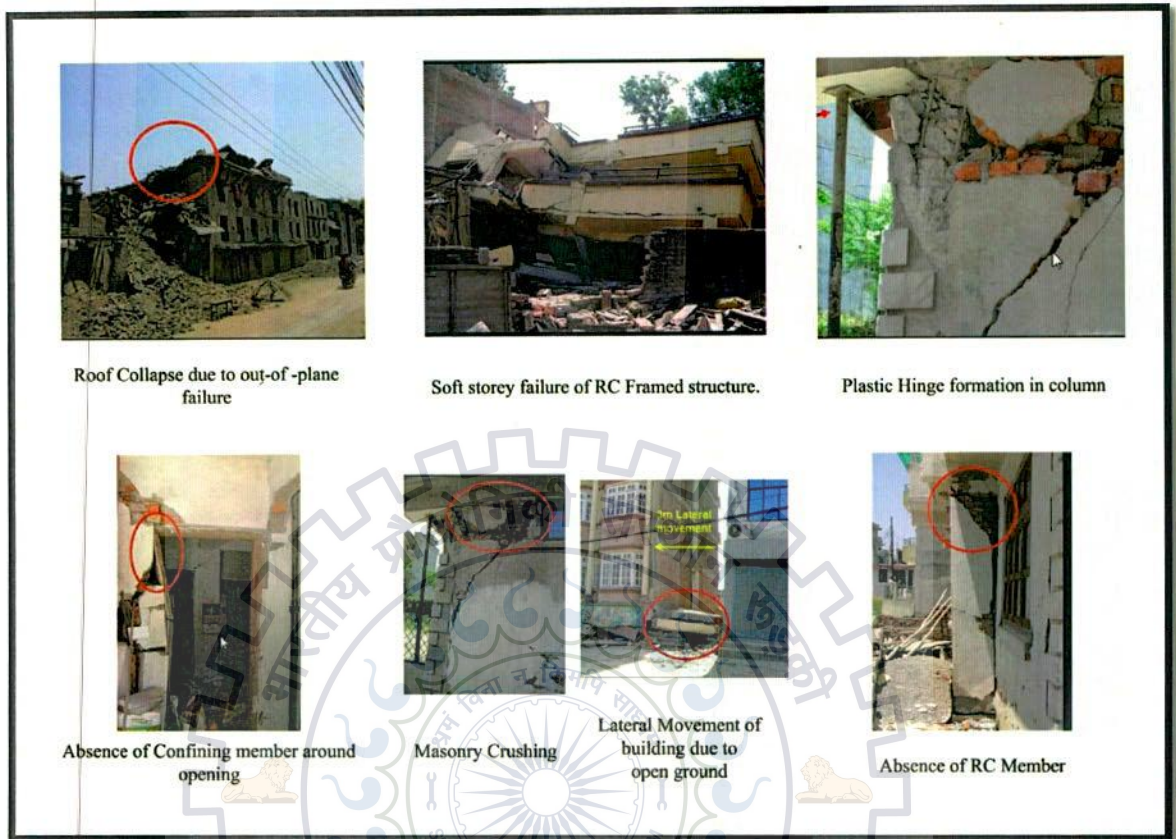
Various types of Cracks and Failures in Brick Masonry Buildings in Bihar after Gorkha Earthquake 2015
